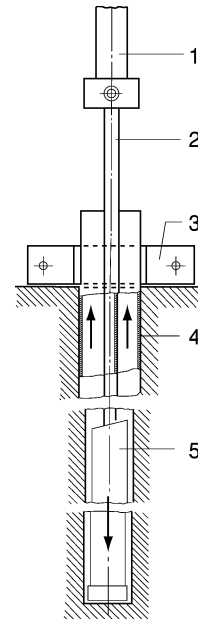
Detail of direct flushing tubular drill rod. 1, Drill head; 2, drill stem; 3, casing clamp; 4, casing; 5, core drilling string.
